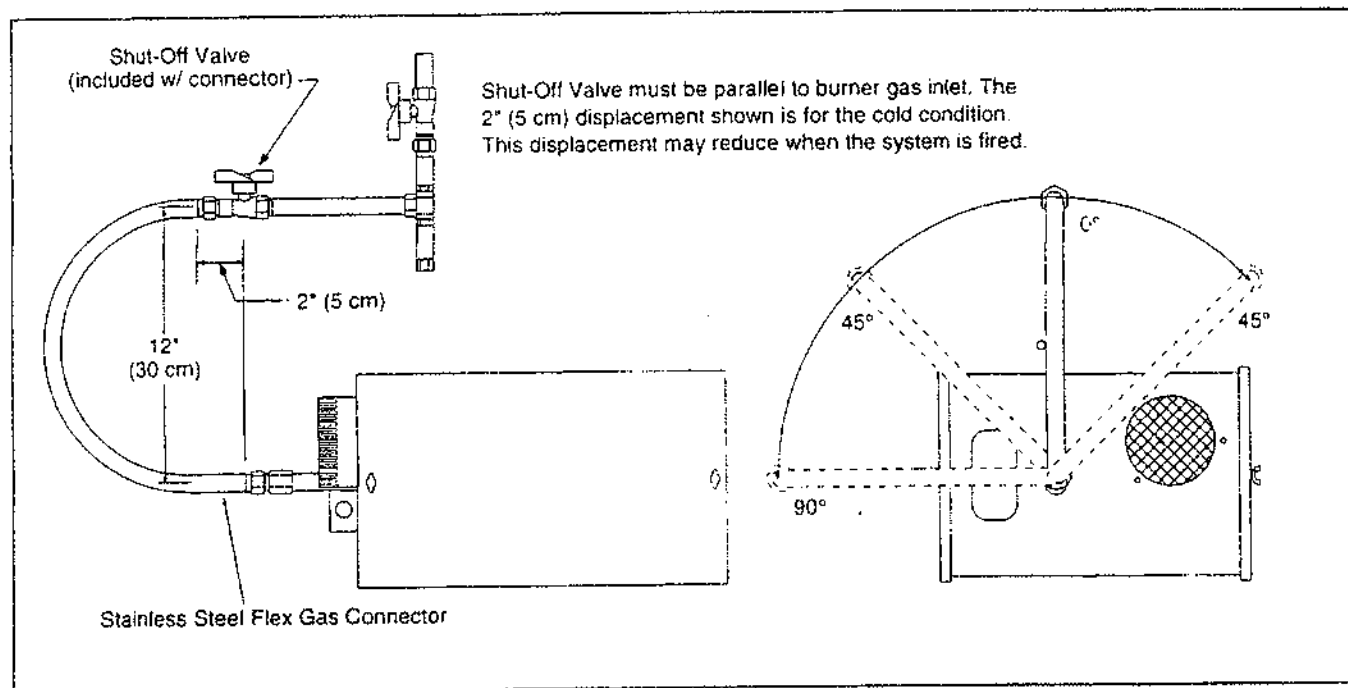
Gas Line Connection with Stainless Steel Flex Gas Connector
